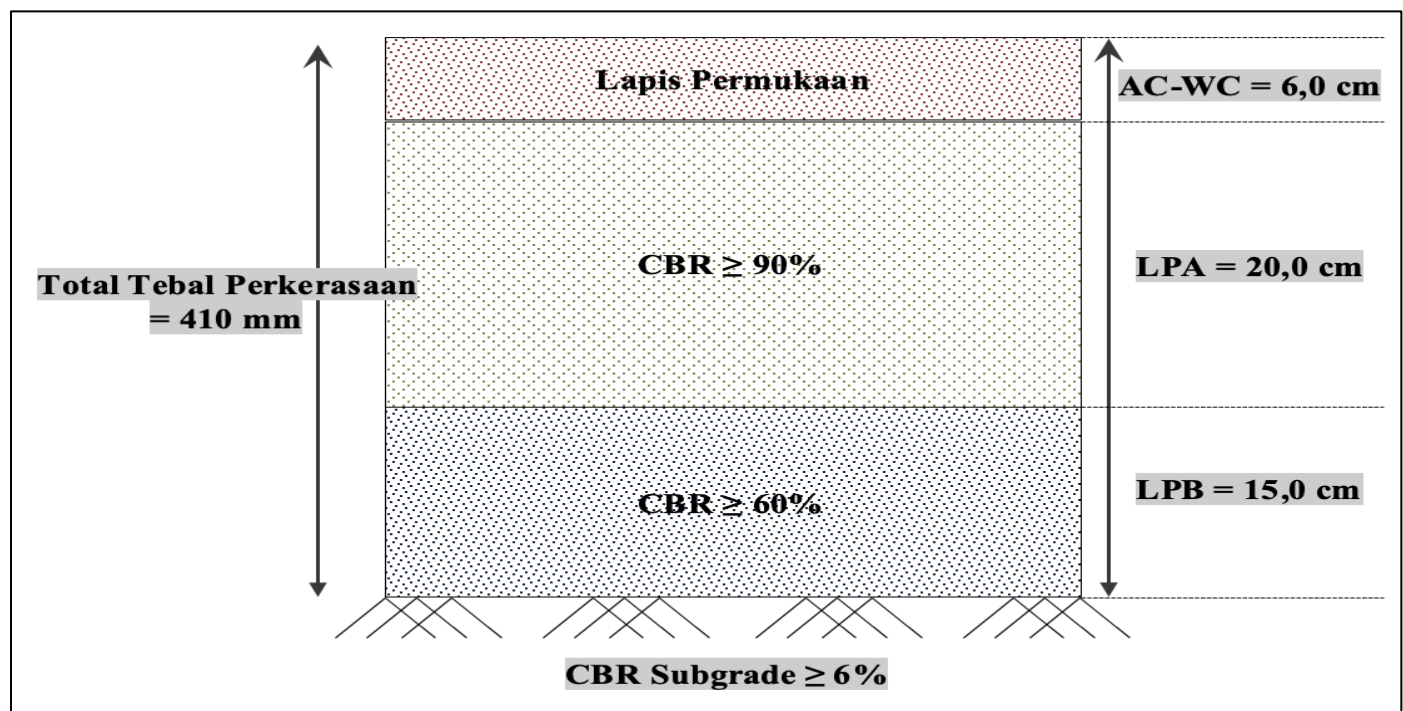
Pavement Structure of Adam Malik Road Based on MDP 2024
